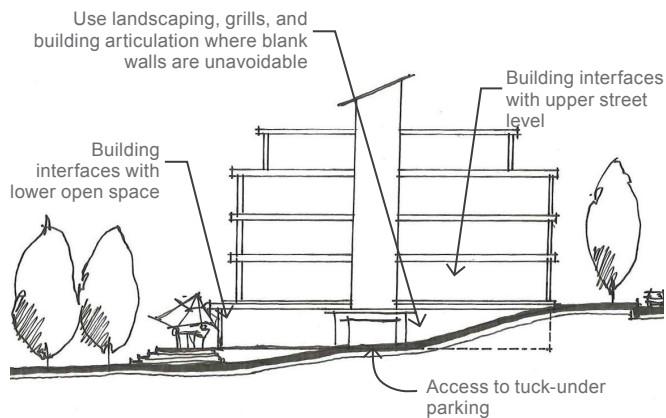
Use grade changes to provide tuck-under parking while maintaining active frontages adjacent to streets and public open spaces.
